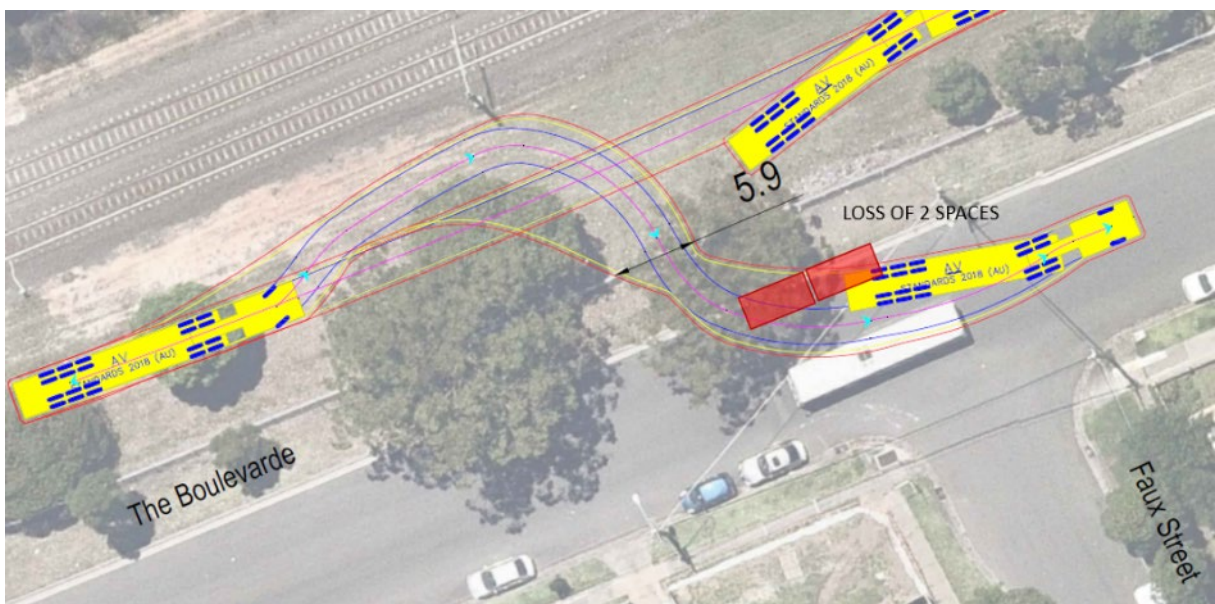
WP5 – M24 15.962U Parking Space Loss
